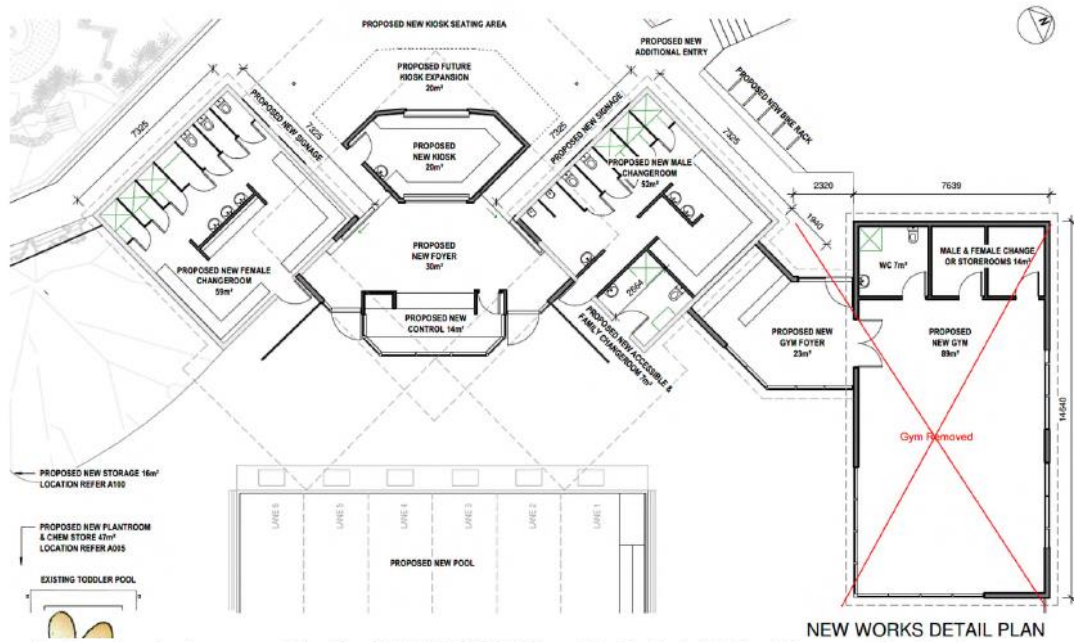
Previously Approved (under DA.2021.1258) New Works Detail Plan (Prepared by Paul Barnett Design Group)
